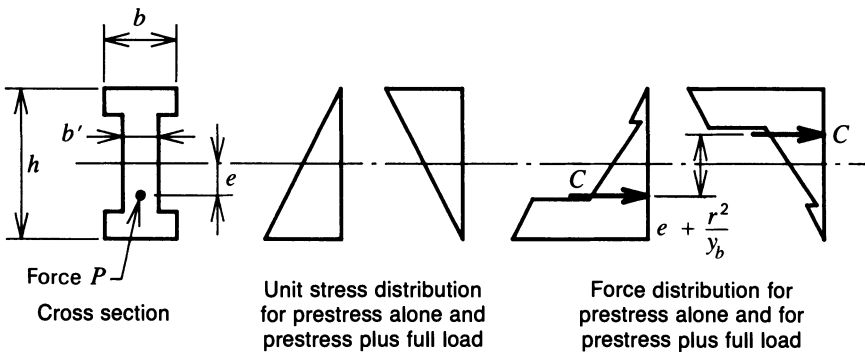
Distribution of unit stresses and forces in a beam with I-shaped cross section, under prestress alone and under prestress plus full load.
